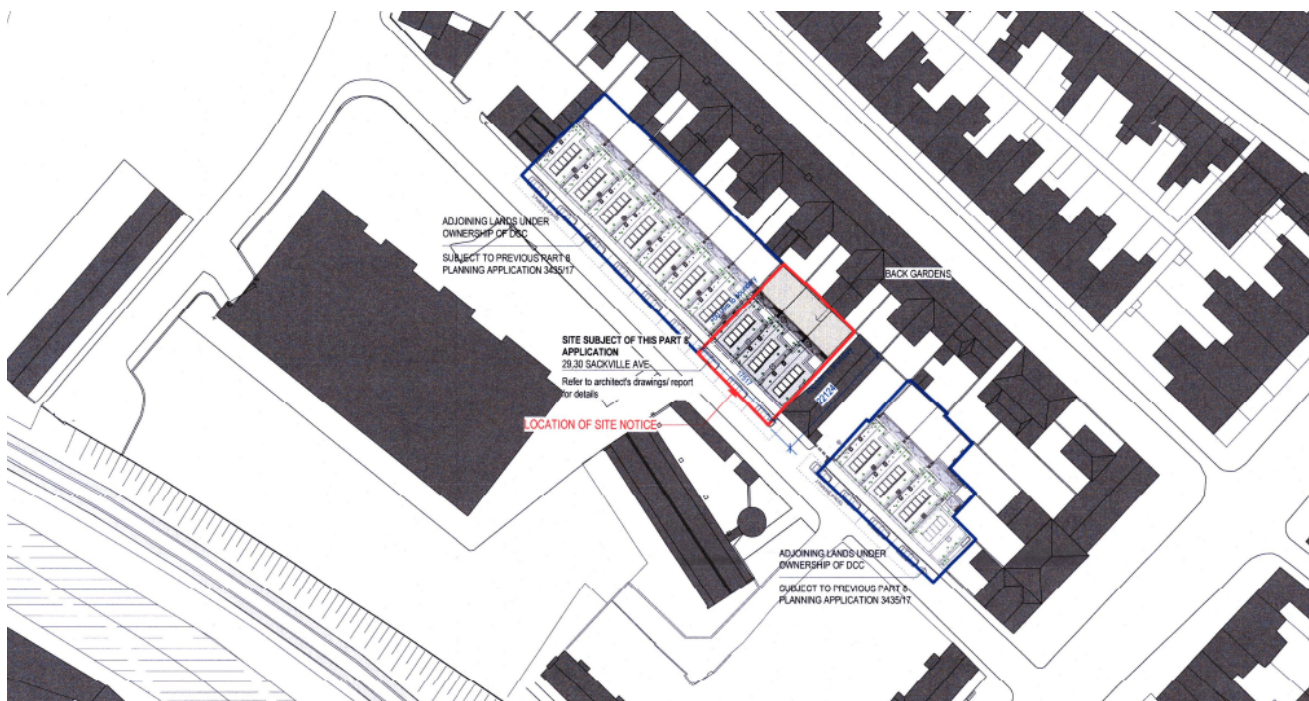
Permitted Site Layout Under PA. Reg. Ref. 3435/17
